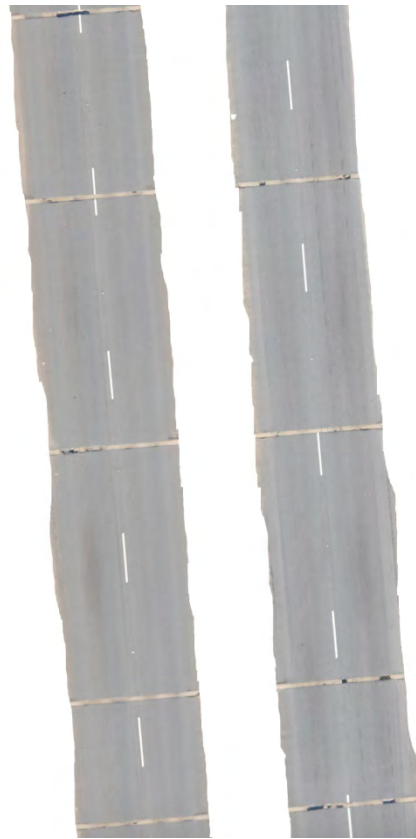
Aerial image of Mallard Creek Church Road Bridge with all obstructions removed
